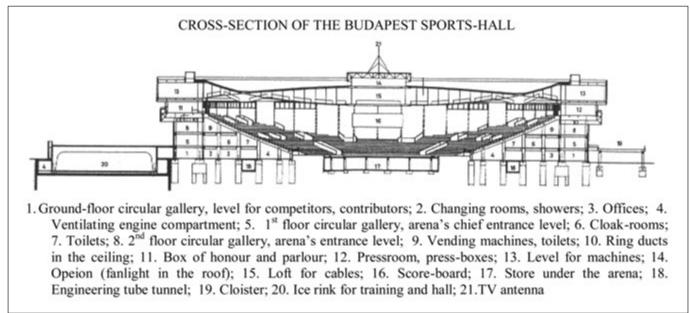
The structure of the Budapest Sports Hall (Kiss, 1986)
